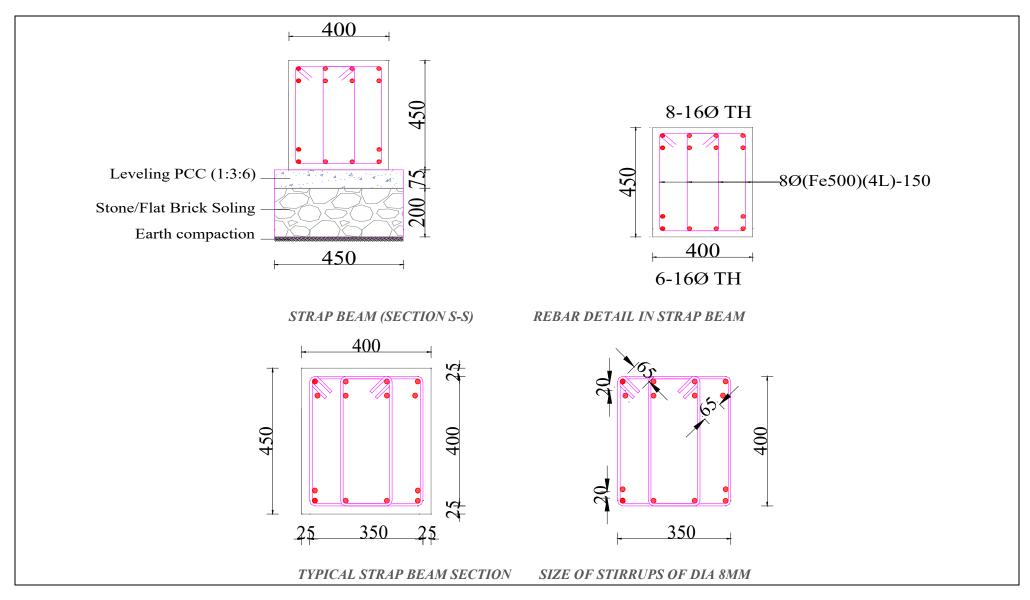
(A) TYPICAL ECCENTRIC FOOTING DETAIL OF THREE STOREY BUILDING
